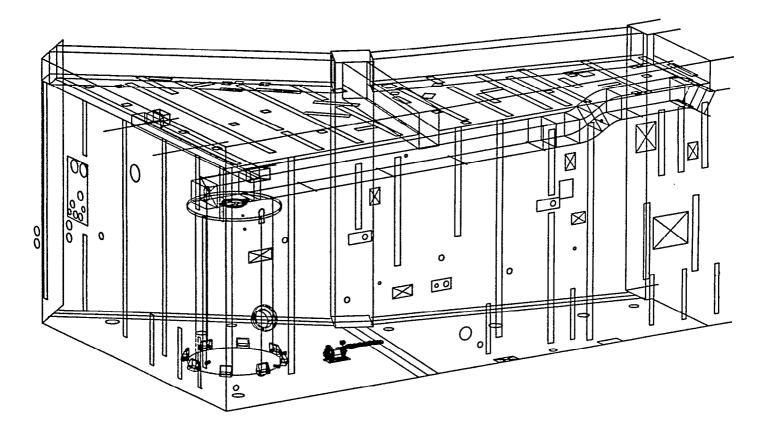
Heating, Ventilating, and Airconditioning Ducts
